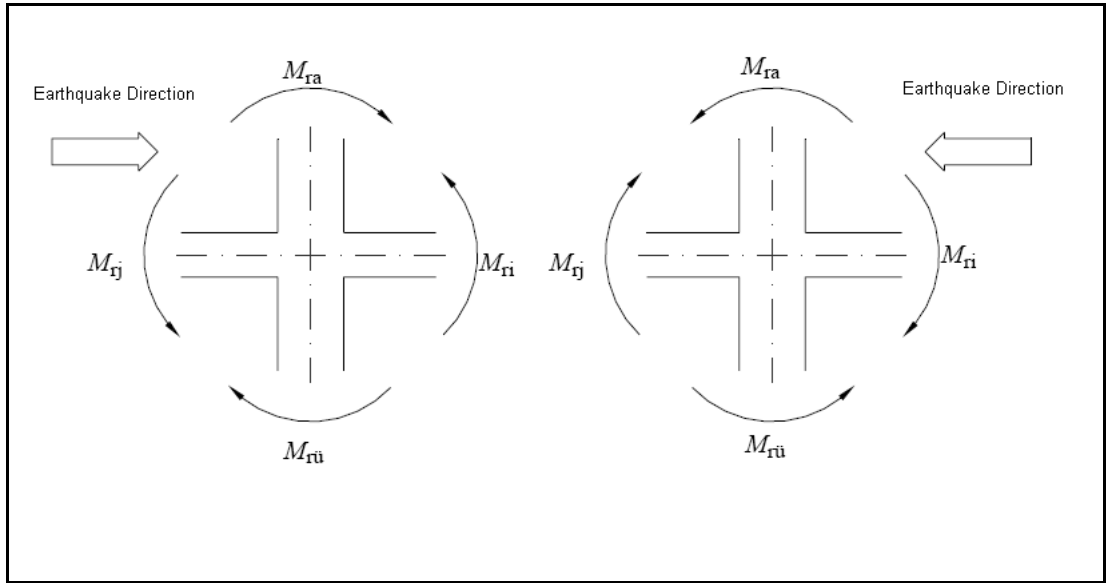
Moment Capacities of Beams and Columns at a Joint [1]
